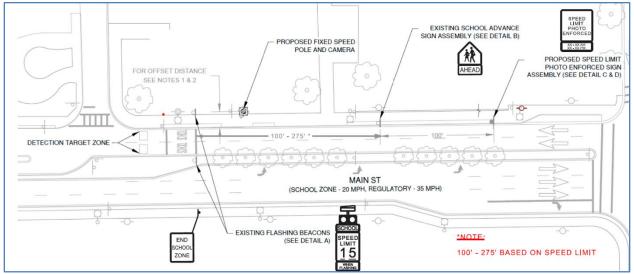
SDS Layout in Relation to School Zone Signs and Flashing Beacons (Source: Verra Mobility)
